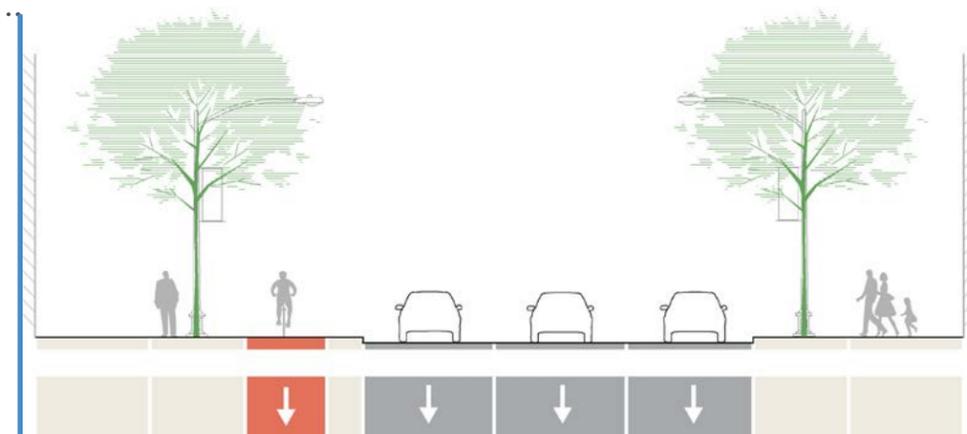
Eighth Street typical section Trinity Street to I-35
